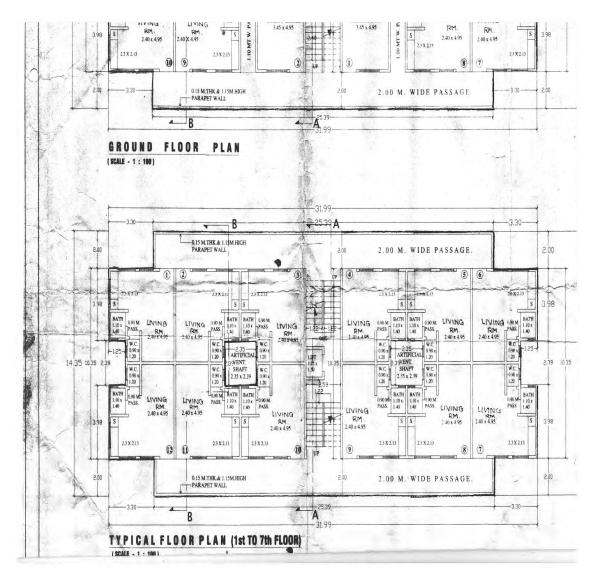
LAYOUT PLAN OF 1ST TO 7TH FLOOR
